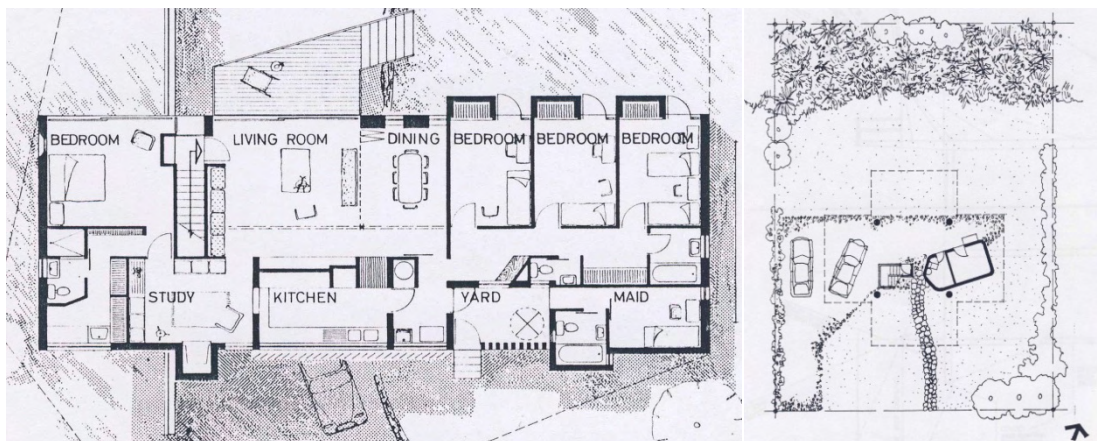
Previous page left: Plan of House Bertie Roberts (1965) (Anon, 1968:12). Previous page right: Ground plan of House Beyers (1998) (Fagan archive - Job No. 9813. Left: Concrete service beams at House Bertie-Roberts (1965) (Fagan archive - Job No. 644,undated). Right: Concrete columns and cantilevered beams and slab at House Beyers (1998) (Author, 2008).
